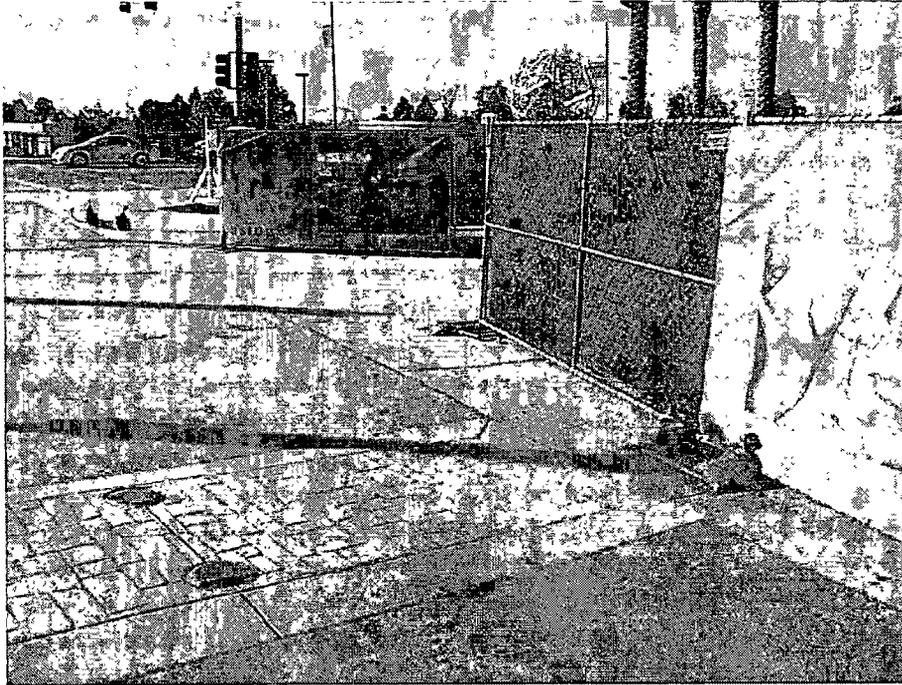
South-facing construction entrance; no BMPs; sediment tracking onto street
